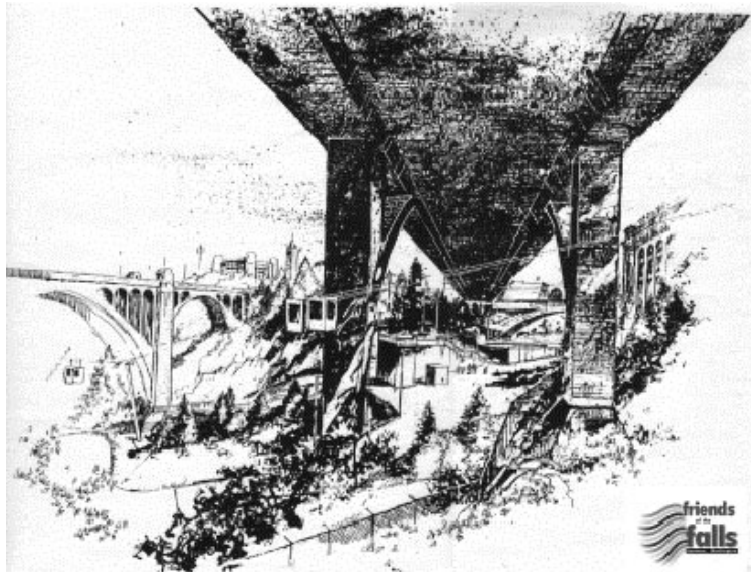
Artist's depiction of the Lower Falls area under the proposed Lincoln Street Bridge. Had the project been built, Spokane's point of origin would have featured three bridges, in addition to the hydroelectric facility's spillway, penstocks and power station. (Frank Sanford, courtesy Friends of the Falls)
